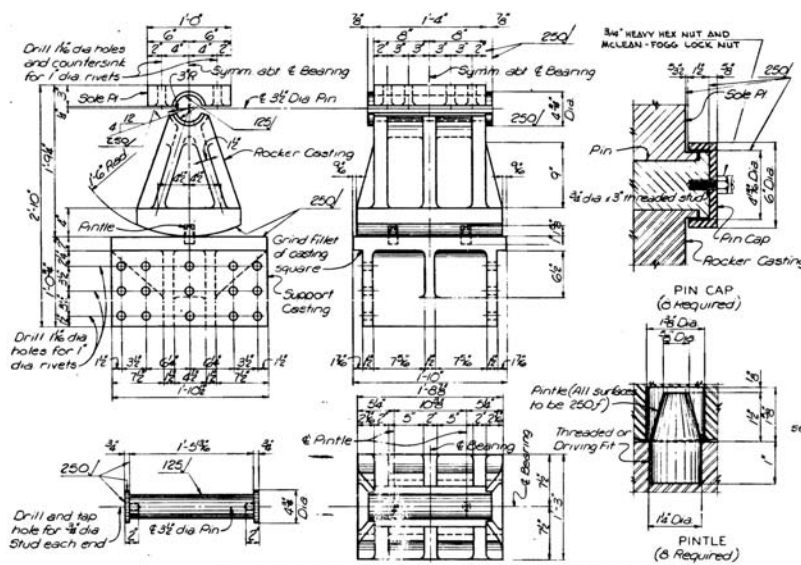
Expansion bearings between approach span and main truss at panel points U0 and U0' (from Mn/DOT 2008).
